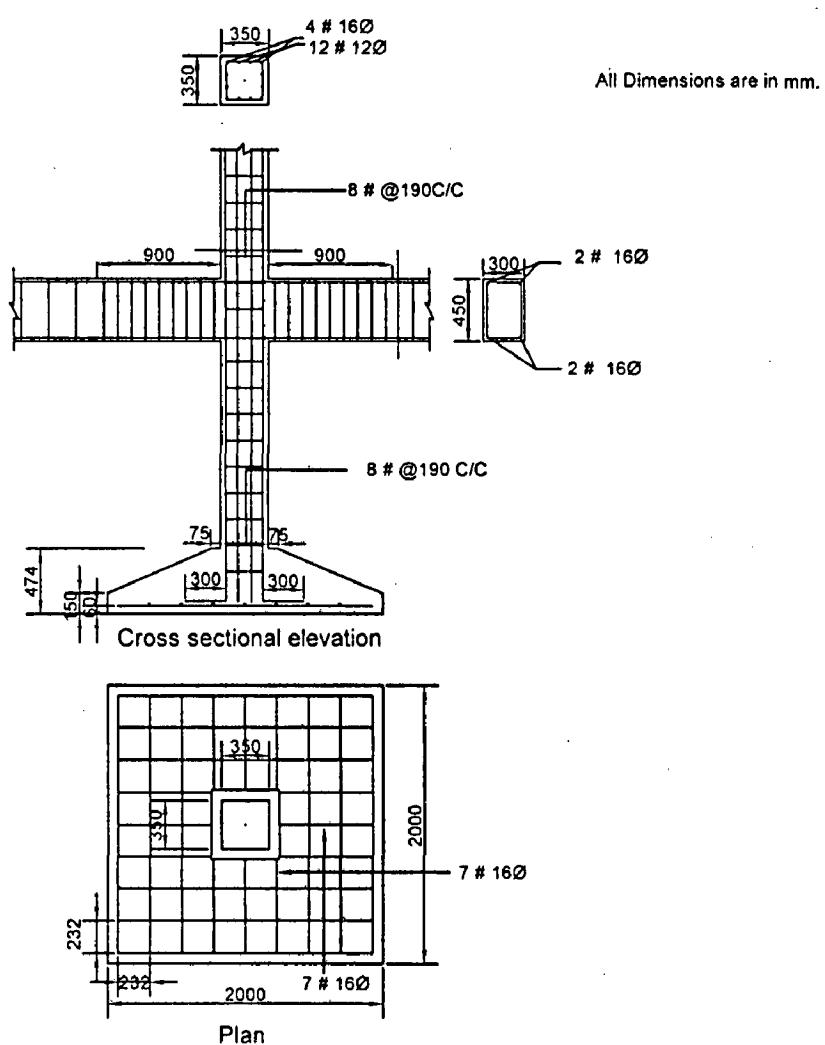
Details of column and footing reinforcement of exterior frame for Zone II
